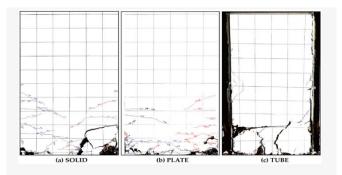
CRACK Pattern of Specimens after Experiment. (Kim et al., 2021)
